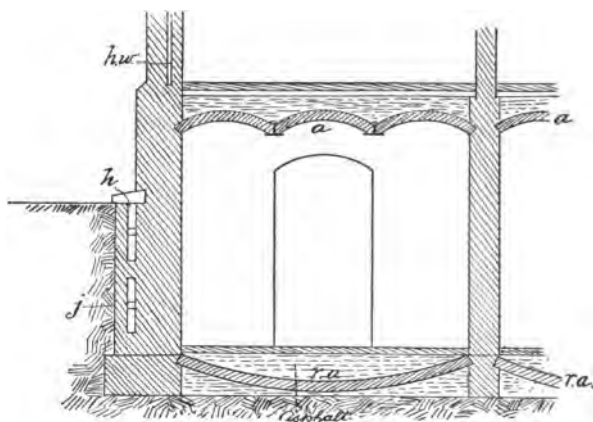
Double foundation walls; *h.w.*, air-space between inner and outer walls of house; *h, j*, air-space in foundation-walls; *a*, arched roof of basement; *r.a.*, *r.a.*, reversed arch of basement floor.
